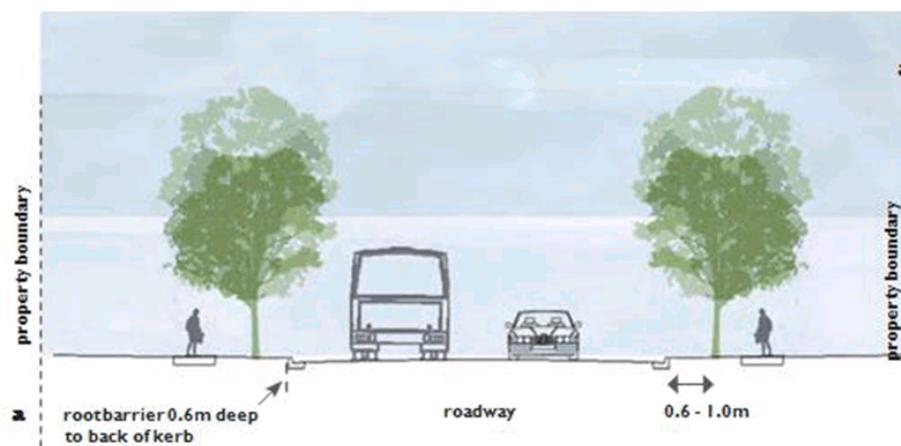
Typical cross-section street tree planting, showing minimum setback distances. Where concrete paths are not required as a consent condition and the location of services allow, trees will be located mid-way between back of kerb and property boundary (where space permits, trees will be located as far from roads, kerbs and paths as possible). Landscape design must be integrated with civil design to ensure the side of the road to carry an intended footpath/bikeway is not constrained by above or below ground utilities.
